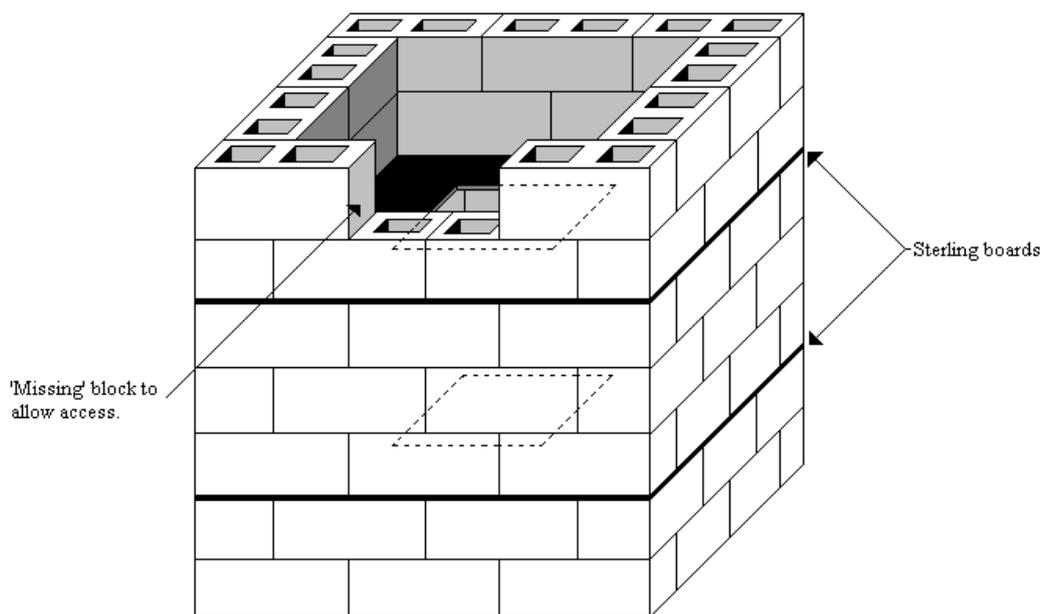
UPPER SECTION. Showing 'missing' block to allow bats access.
